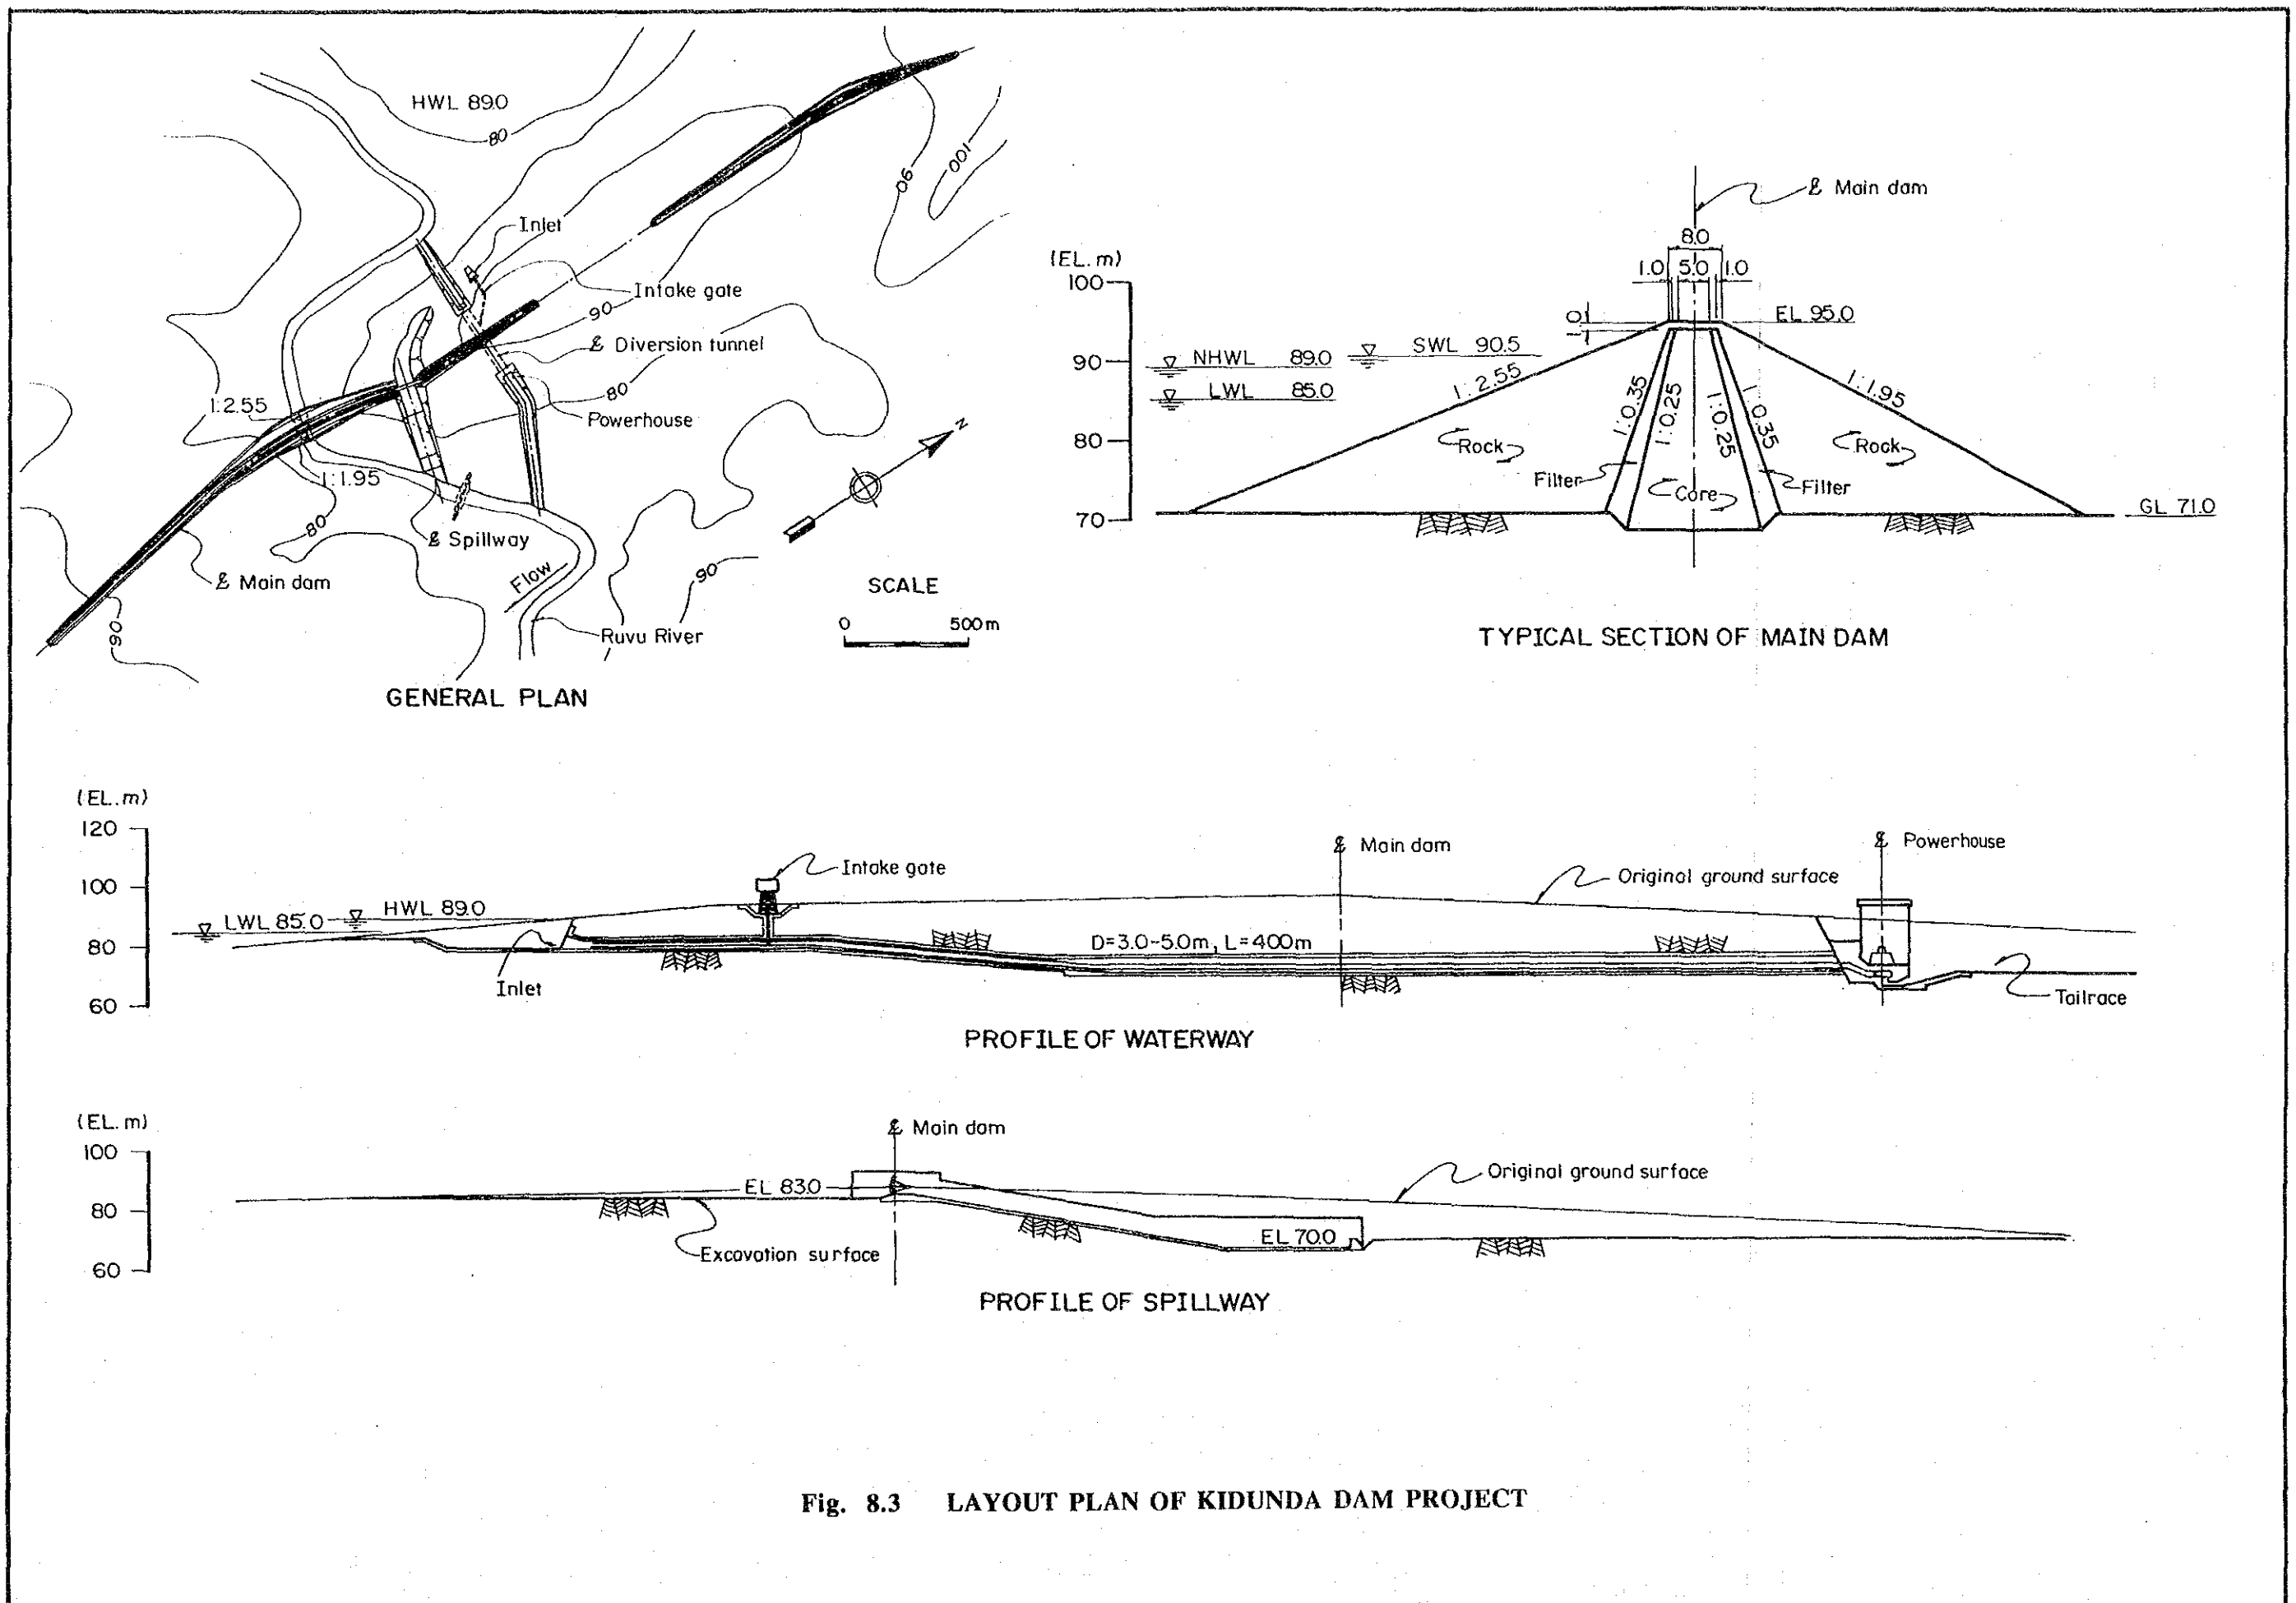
LAYOUT PLAN OF KIDUNDA DAM PROJECT
